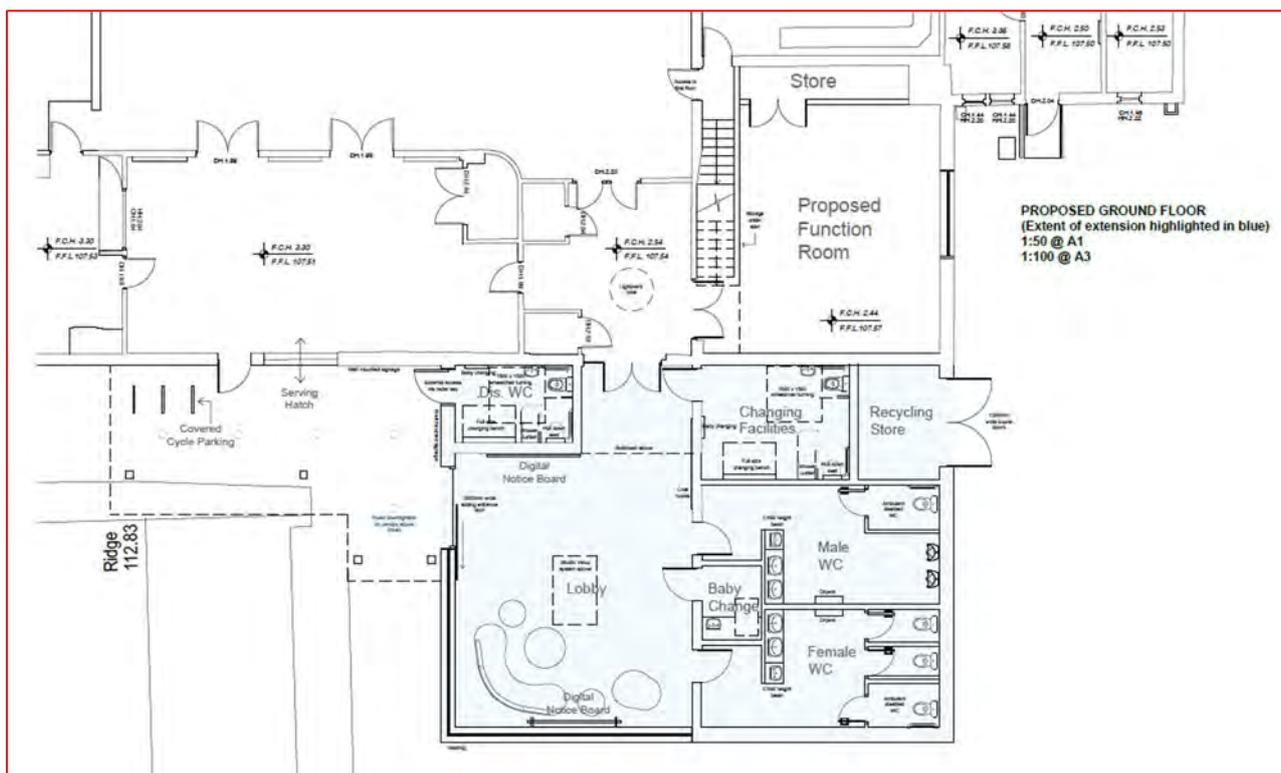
Option 1 Community Hall Proposed Ground Floor Plan
